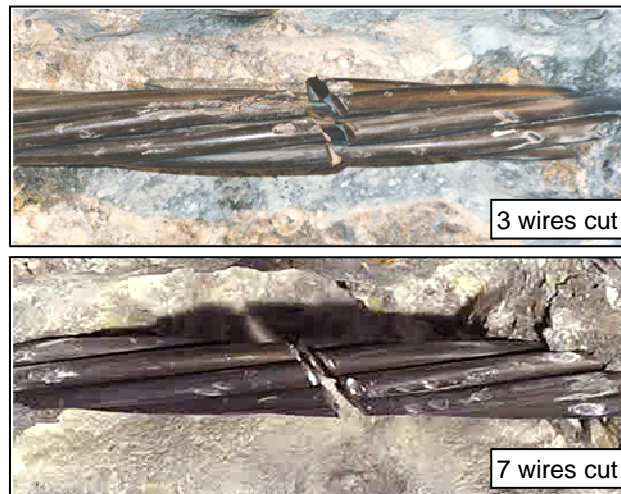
Damaged outer steel tendon in specimen RP1 (top) and RP3 (bottom)
